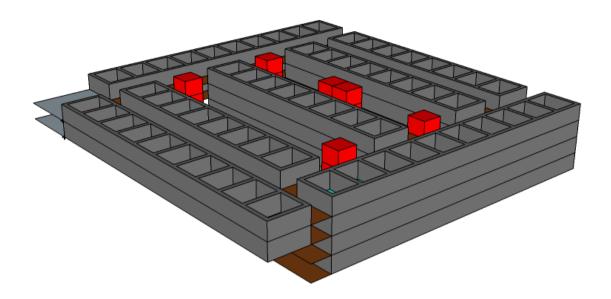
3D view of the accommodation building, roof and outer walls are hidden
